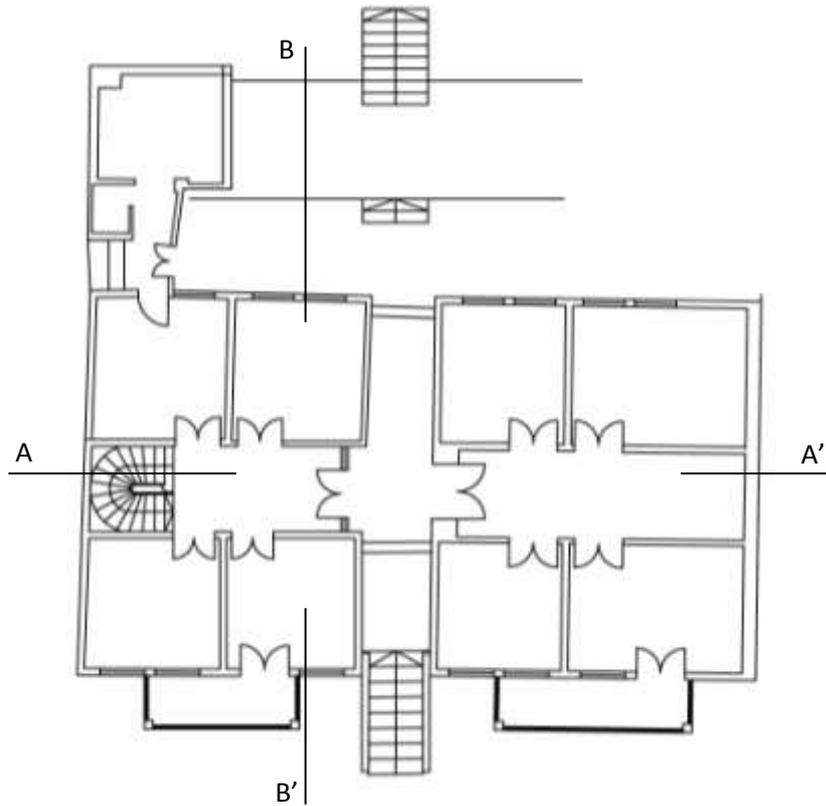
Entrance floor plan of the house at 154 lot 24 parcel
